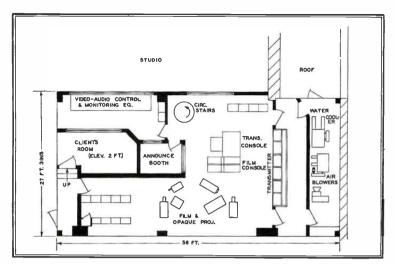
WHAS STUDIOS, OFFICES ON 7TH FLOOR OF DOWNTOWN BUILDING. TECHNICAL AREAS ARE ON MEZZANINE OVER SHADED SECTION
